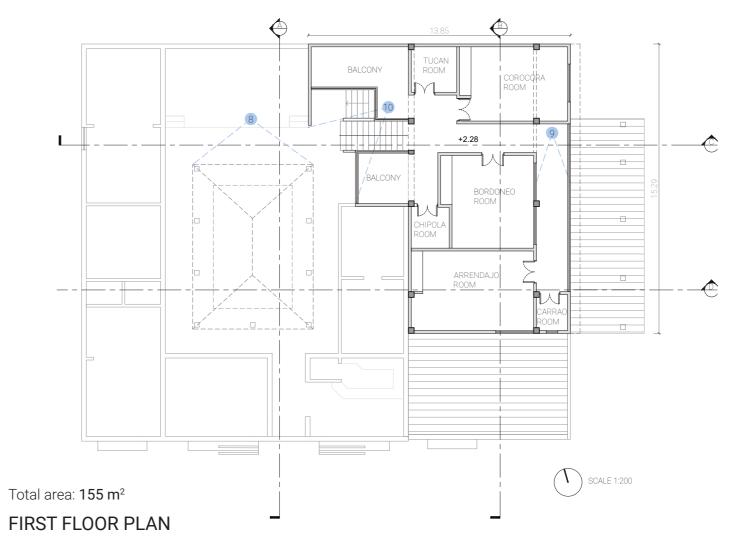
First floor plan of existing building /Source: Batuta Meta PDF drawing .Author's edition
